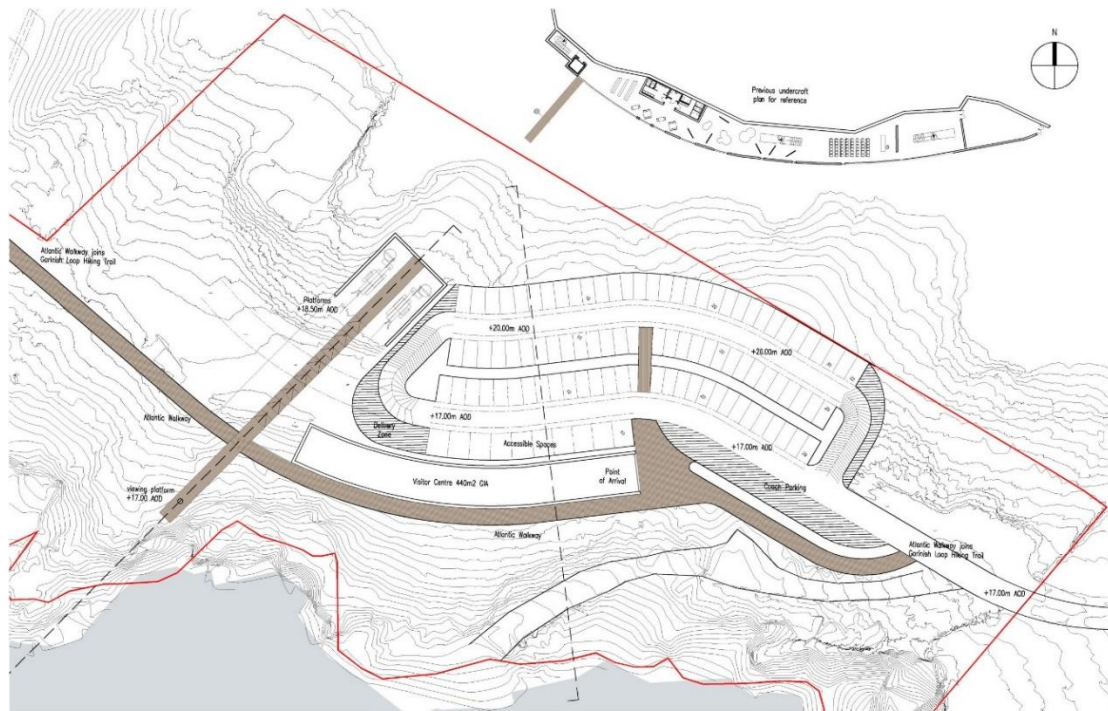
Option 3a architectural site plan showing 'phase 2' carpark
